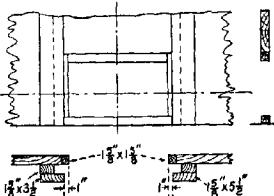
Elevation and sections of broad-edged orifice with wood gate guides.
